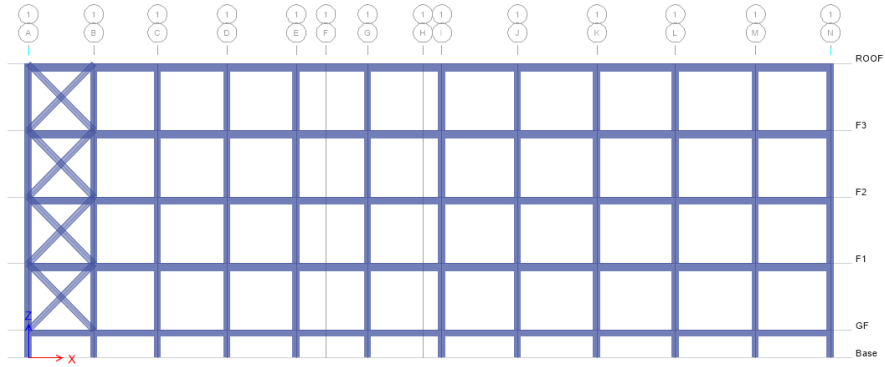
2 X directional bracing of FE Model (Elevation-1)
